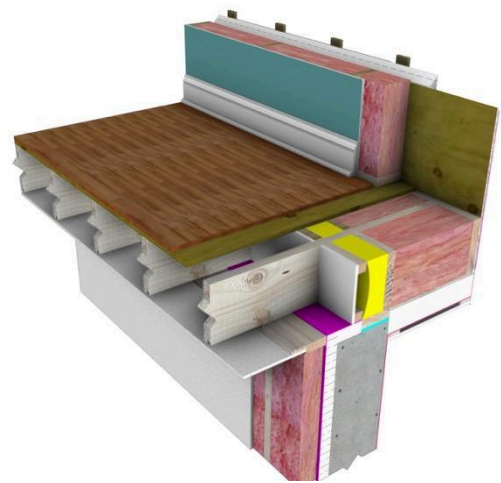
Figure SEQ Figure 1\* ARABIC 1 Projecting or “cantilevered” floor system
